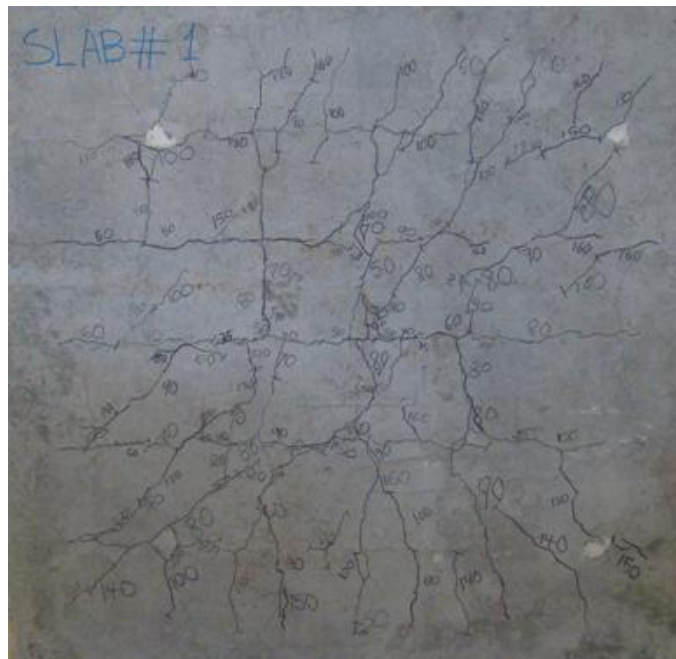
Crack patterns of the test slab HFR200-0.96/0.2
